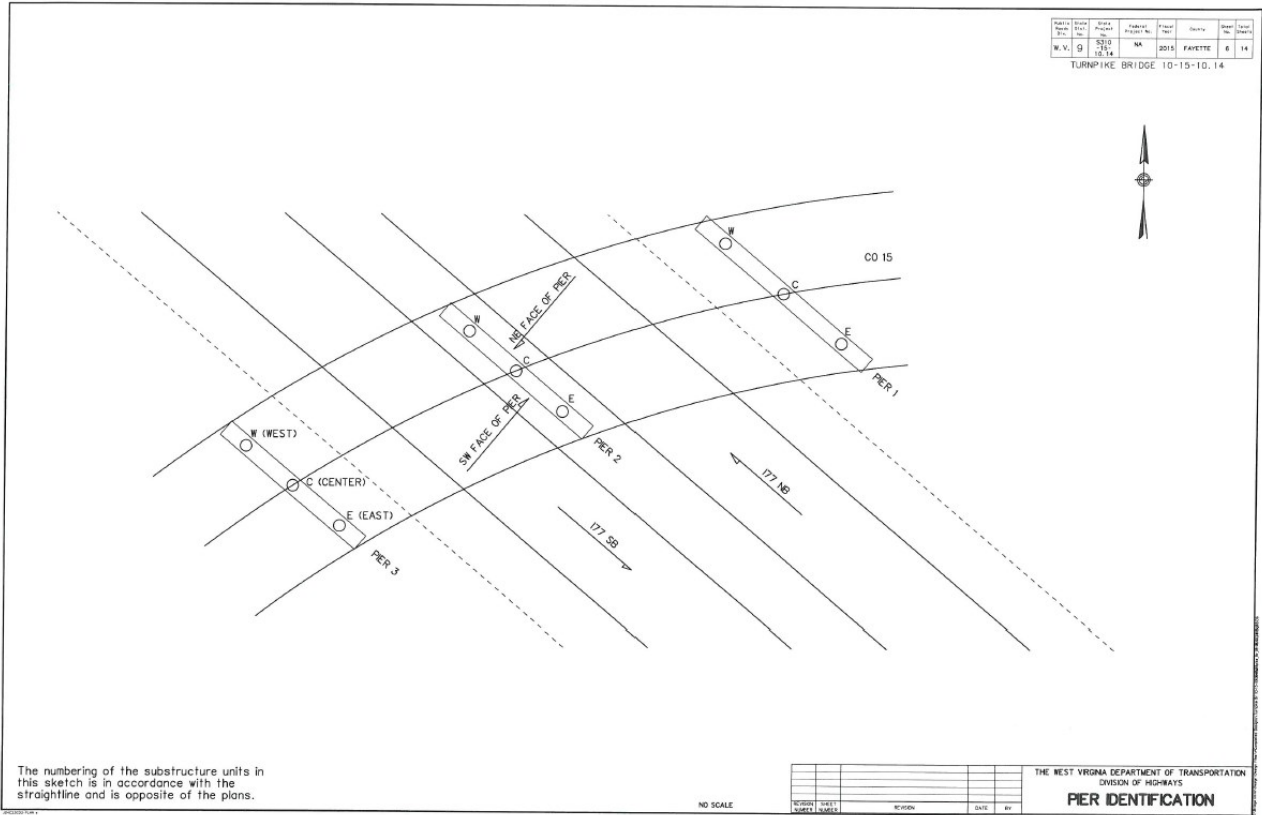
Plan sheets depicting the layout of the Turnpike Bridge.
